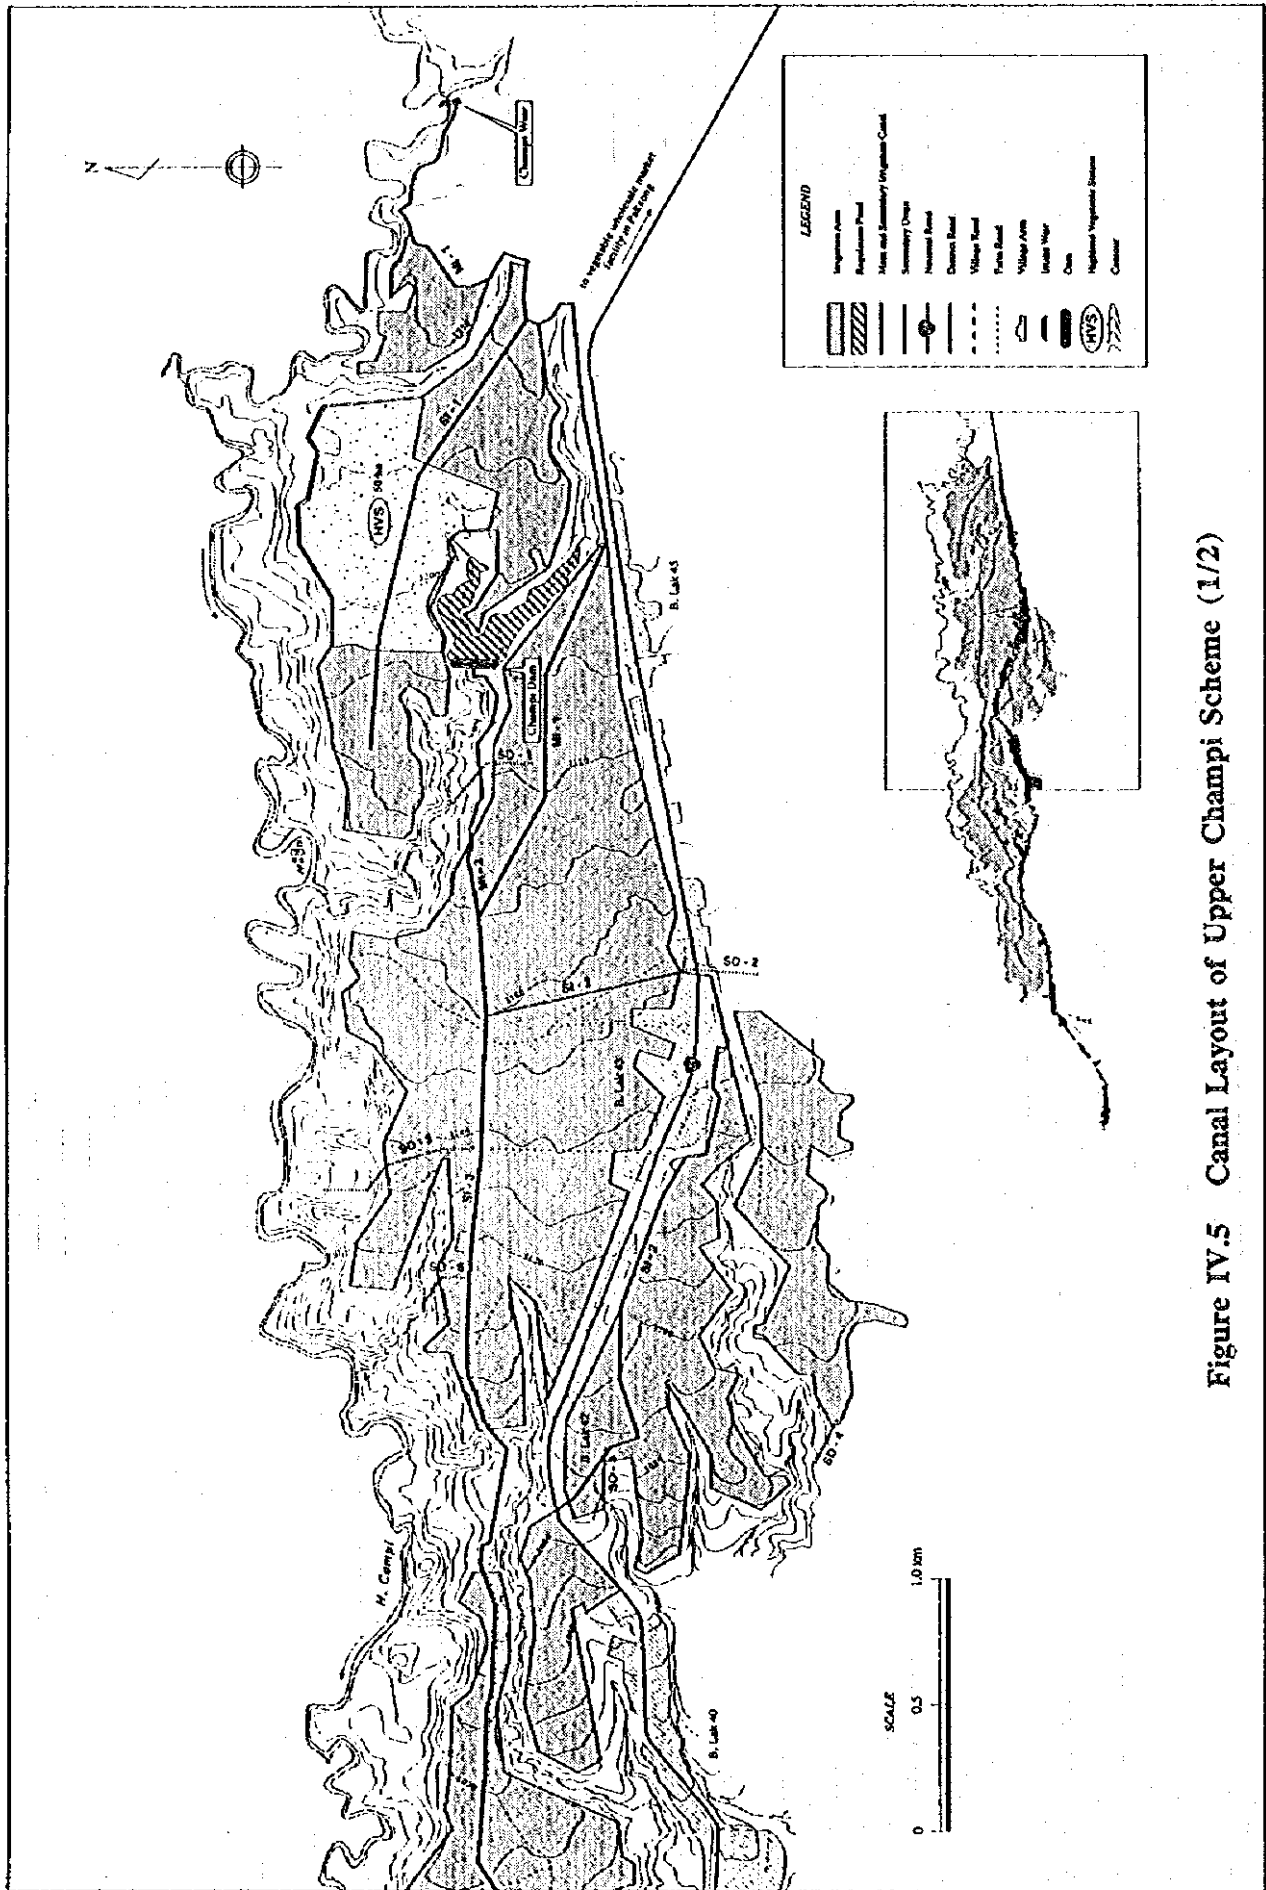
Canal Layout of Upper Champi Scheme (1/2)
